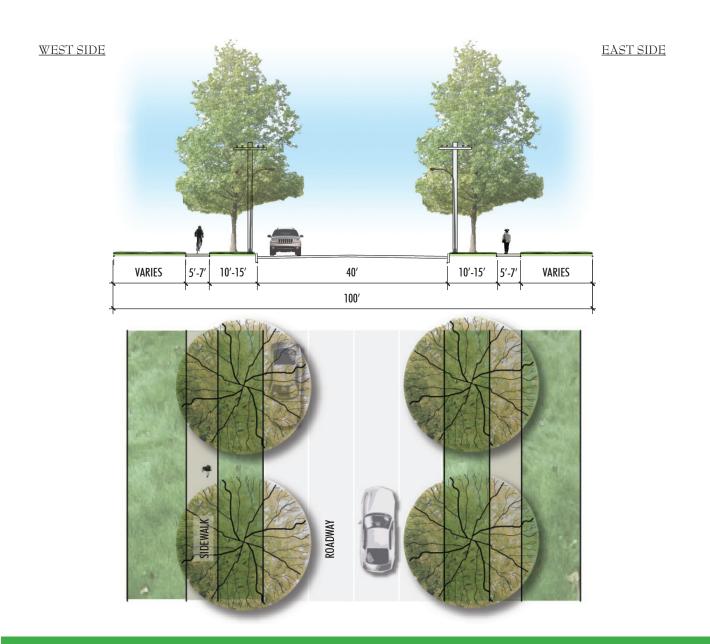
The Hub: Zone 11 Existing Conditions Section and Plan
